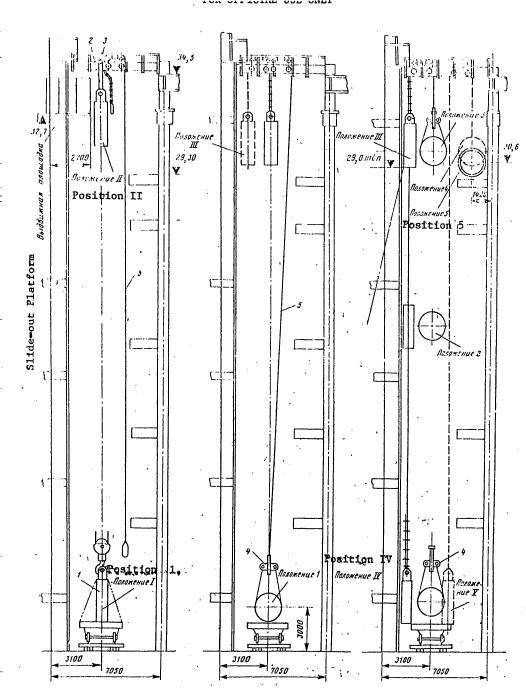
Hoisting a boiler drum with two cranes using a counterweight.
